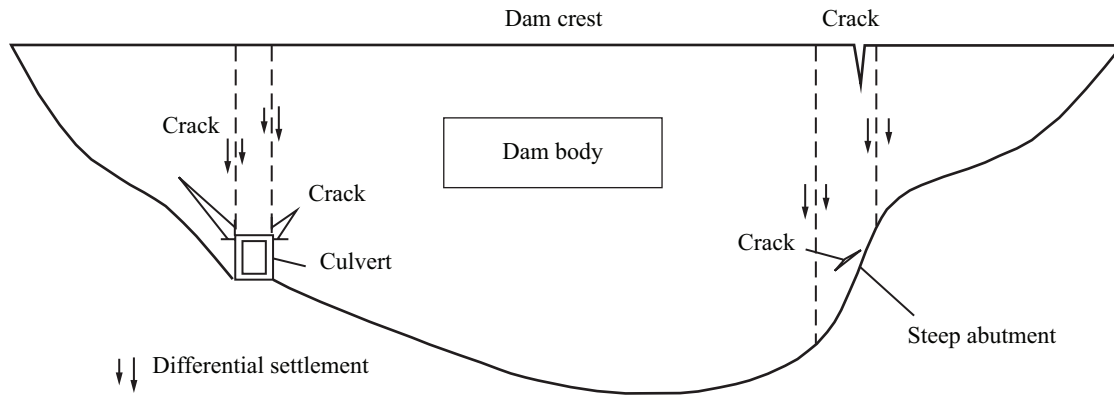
Longitudinal section of the dam — formation of low stress zones and cracks in the vicinity of the conduit and bund in the embankment dam
